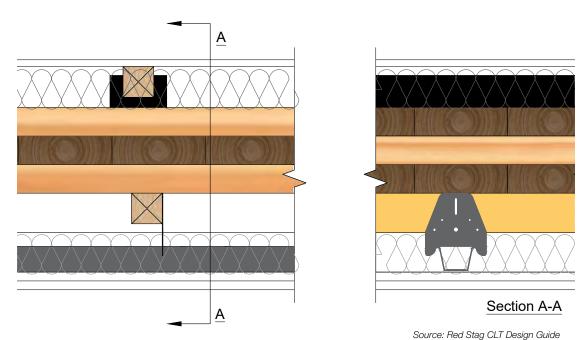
Mass timber floor with a single layer of suspended ceiling lining mounted on timber, resilient acoustic clips and furring channels
